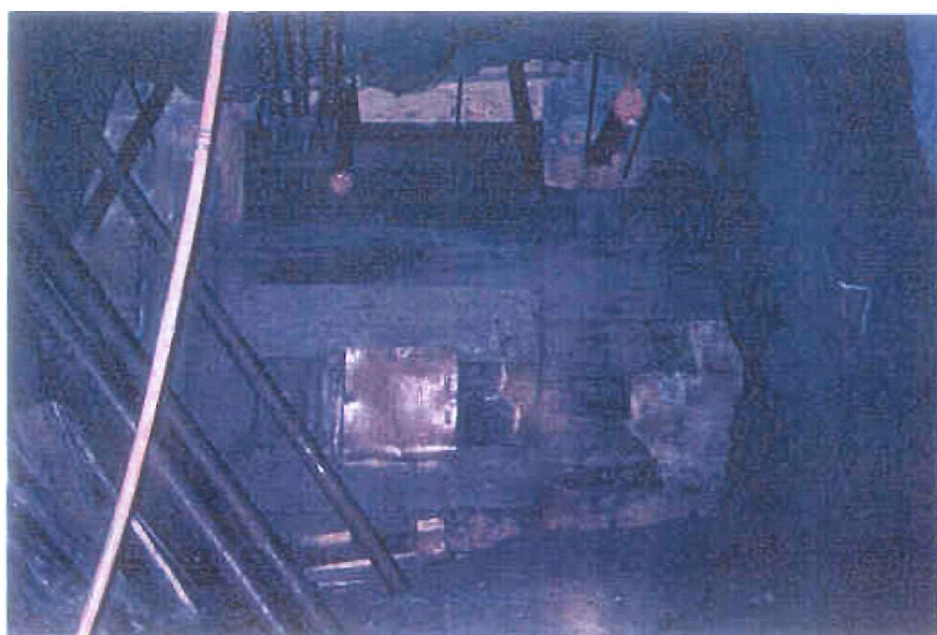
The inclined 4-inch pipelines used for delivery of concrete to seal the bulkheads, plus the steel inspection hatch.
